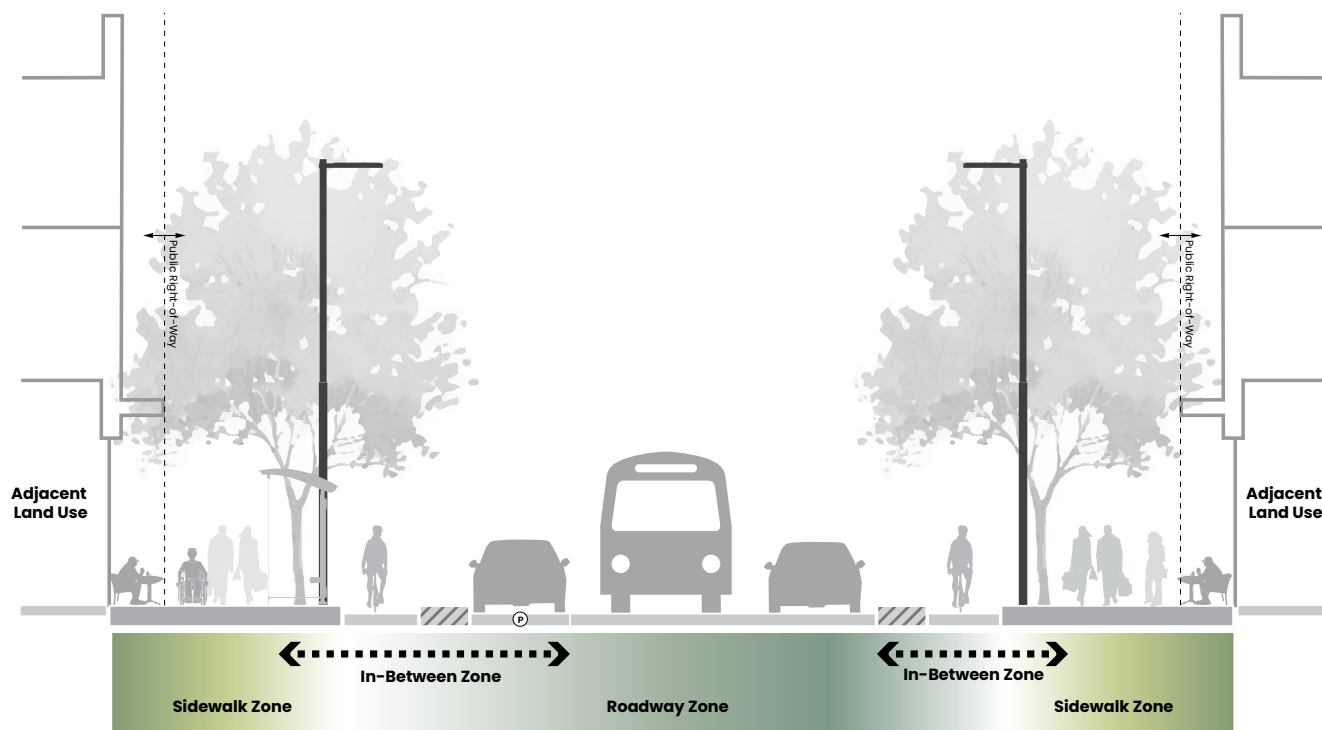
The three street zones that compose the cross section: Sidewalk, Roadway, and In-Between
